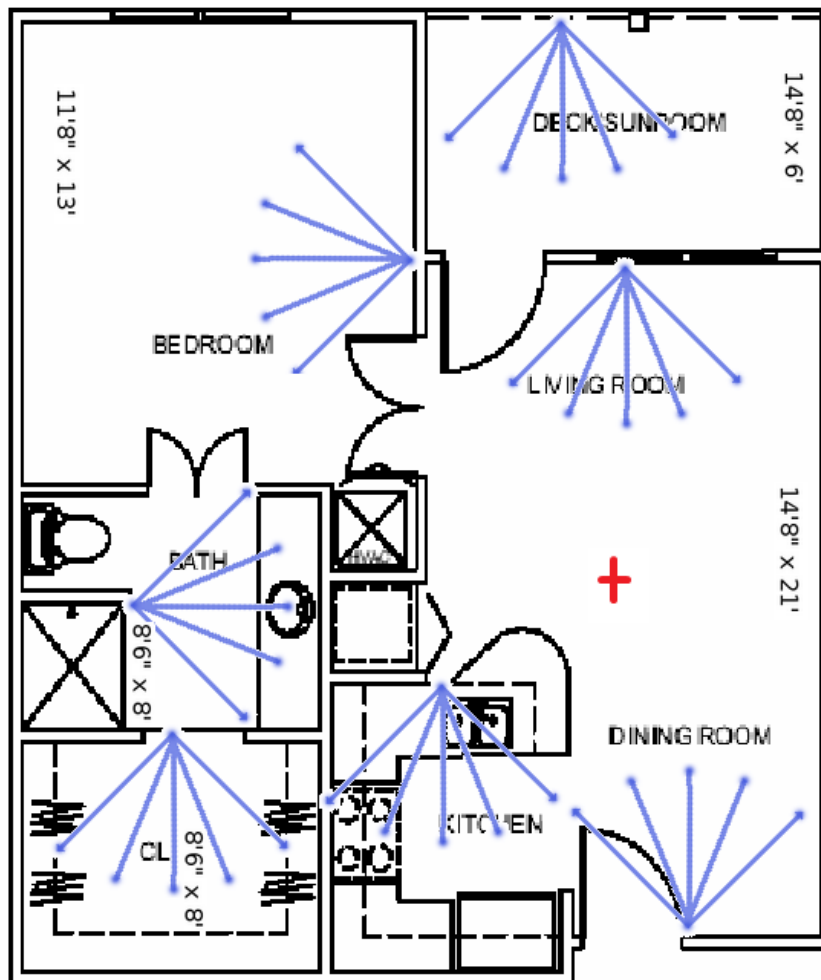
The floor plan showing motion sensors placement in a senior apartment.
